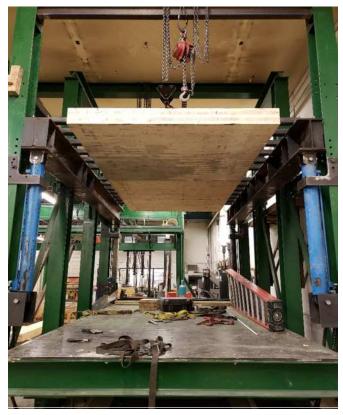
(b): Steel frame and CLT diaphragm before and after erection
